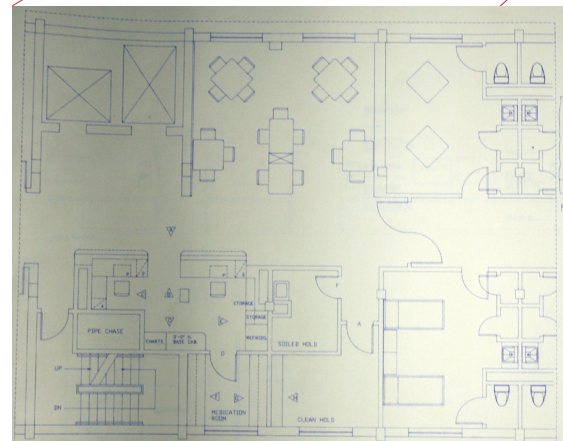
Typical Floor Plan - Skilled Nursing Tower
